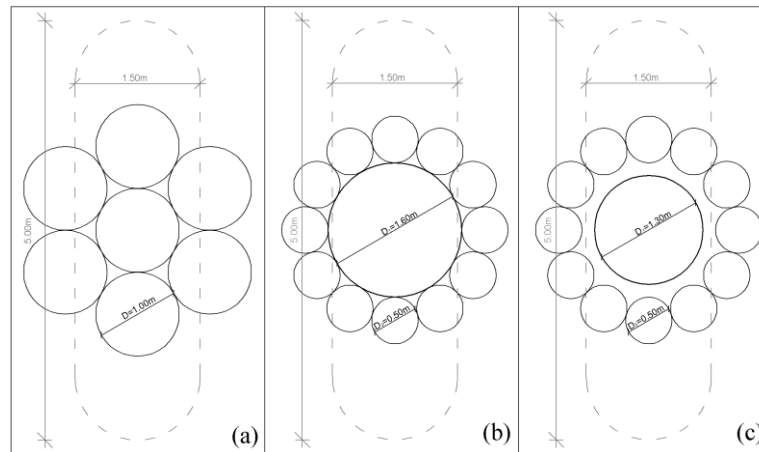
(a) Cross-section of piers of Case A – (b) Cross-section of piers of Case B and P1, P2, P3 and P5 of case C – (c) Cross-section of pier P4 of Case C in contrast with the cross-section of the reference pier
